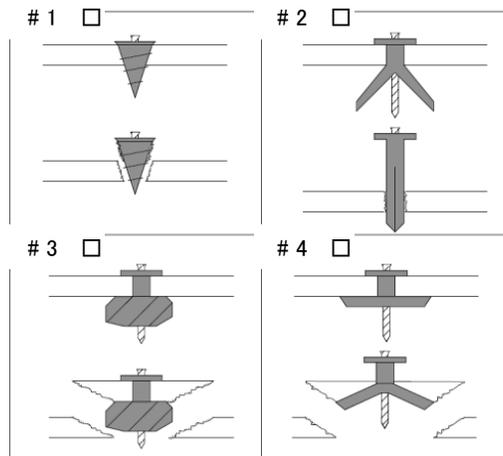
Conceptual drawing illustrating the pull-out fracture.
